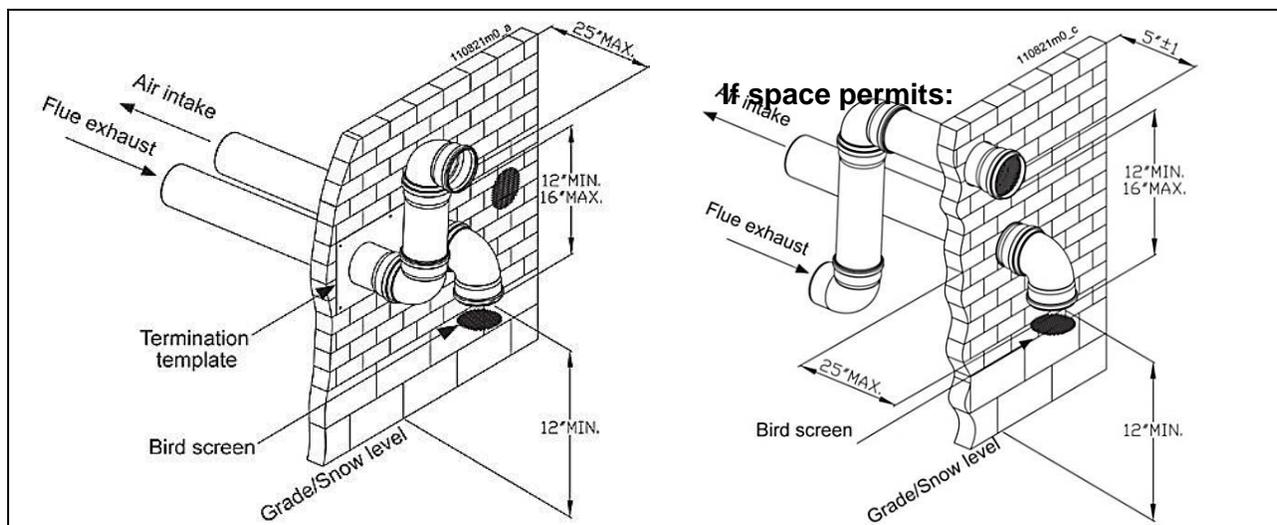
Sidewall Termination of Air and Vent Pipes
